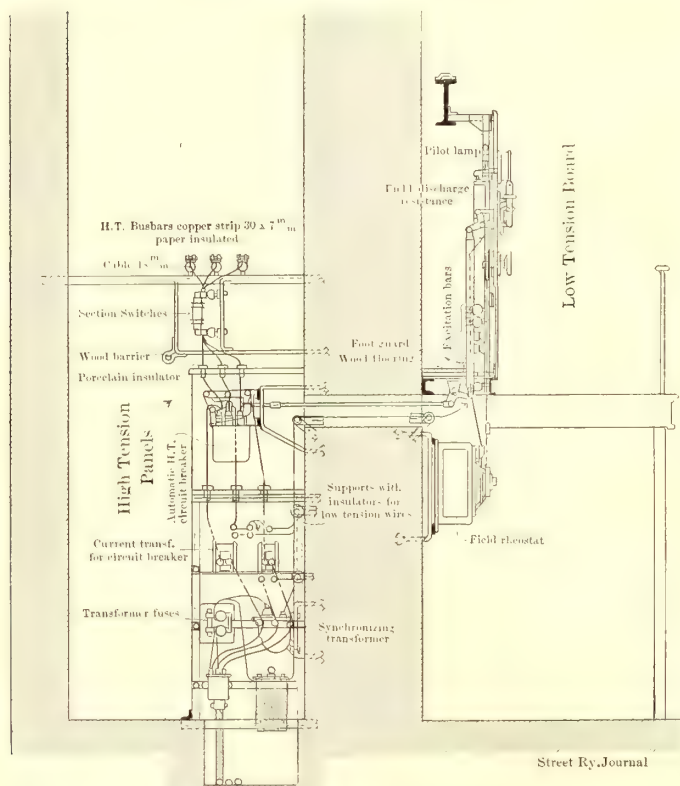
SECTION THROUGH ALTERNATOR PANEL AT LAXEY
